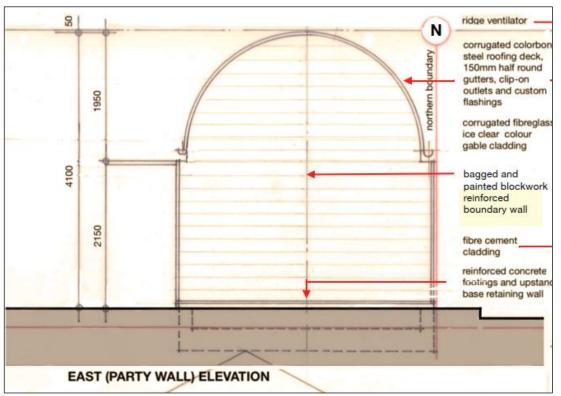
Extract of Drawing No. DA02 of the architectural plans prepared by Studio GA, as submitted with DA/312/2024, illustrating the eastern elevation of the originally proposed garage.
